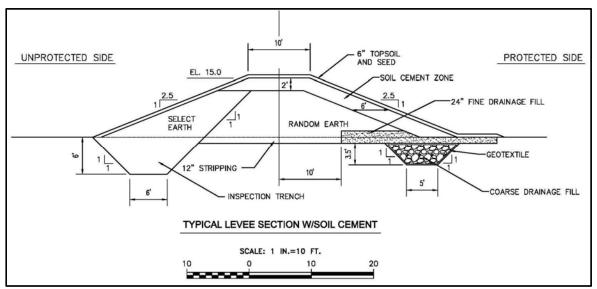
HSLRR Recommended Plan Levee Section (Elevations in ft. NGVD29)
